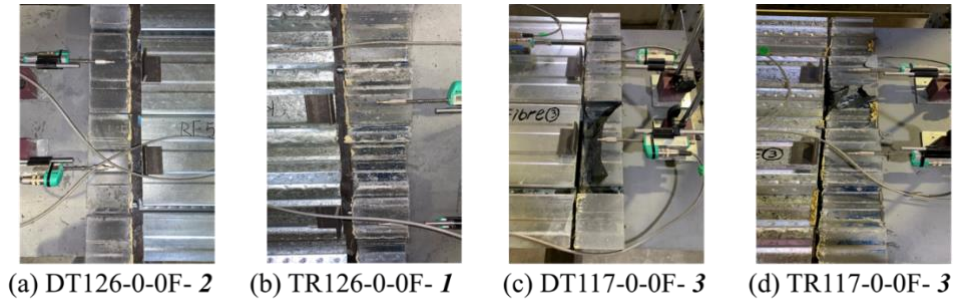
Typical failures of specimens without fibres a) DT; b)TR where cracking did not occur, and c)DT; d)TR where cracking did occur.
